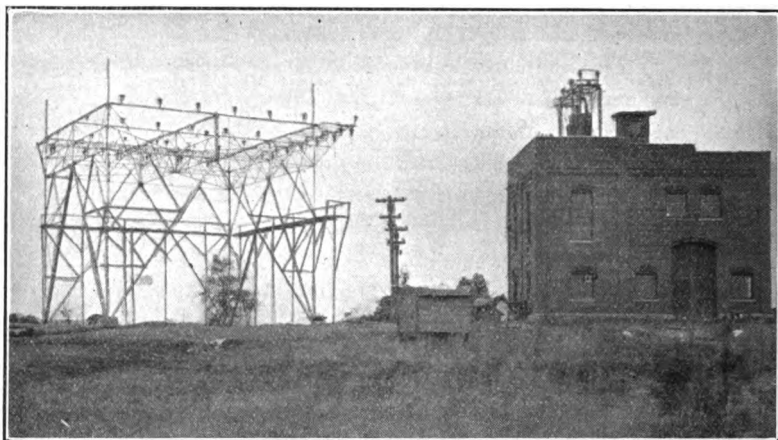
TYPICAL SECTIONALIZING AND BRANCH-OFF STRUCTURE; 66,000 VOLTS.
